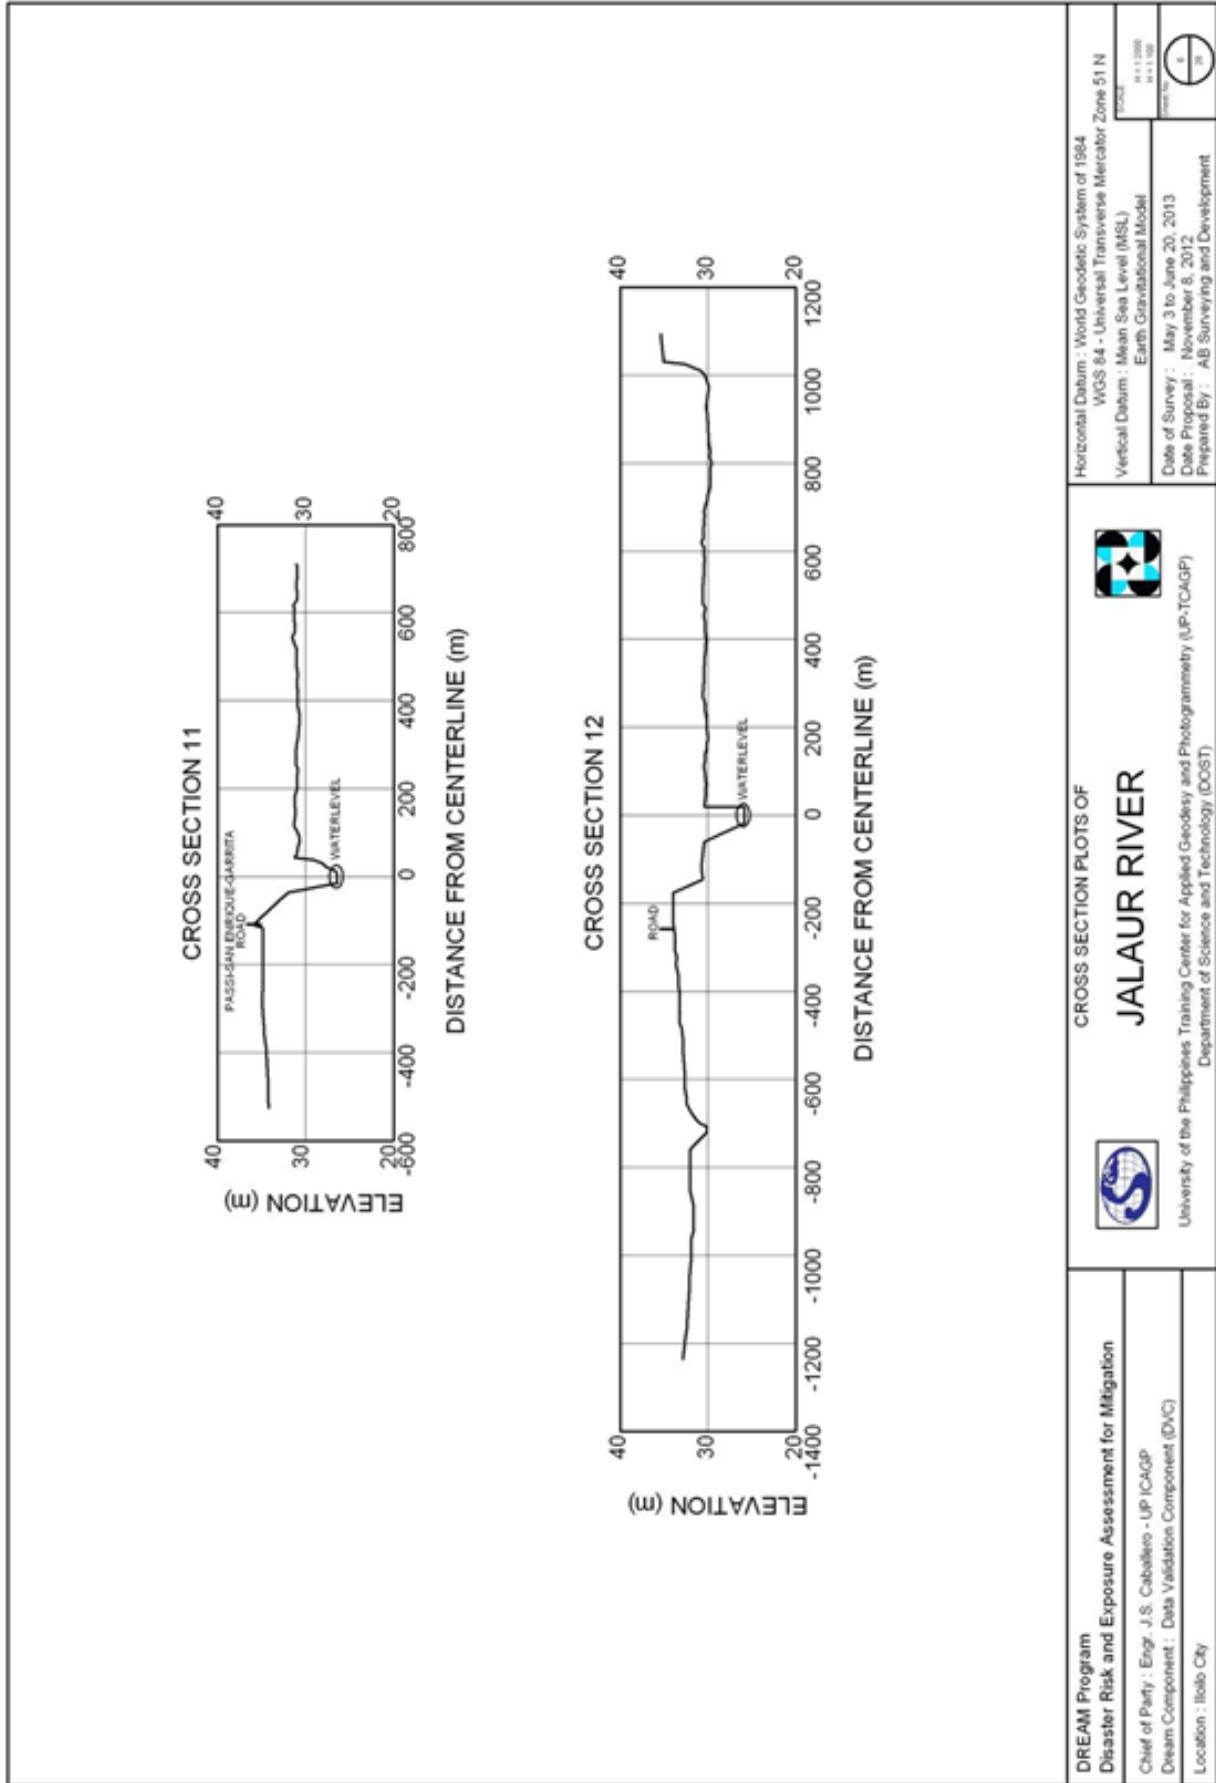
Sheet No.6 of the Cross-section plan of Jalaur River
